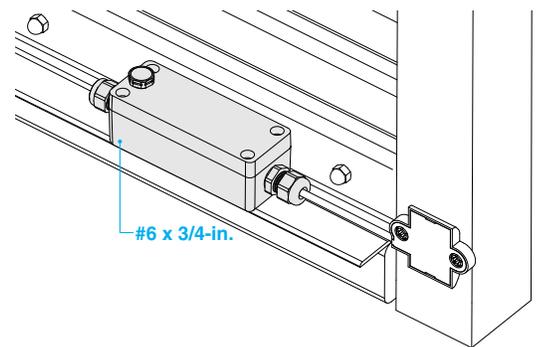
B: Power RX Mounted to the Bottom Bar of a Rolling Door
